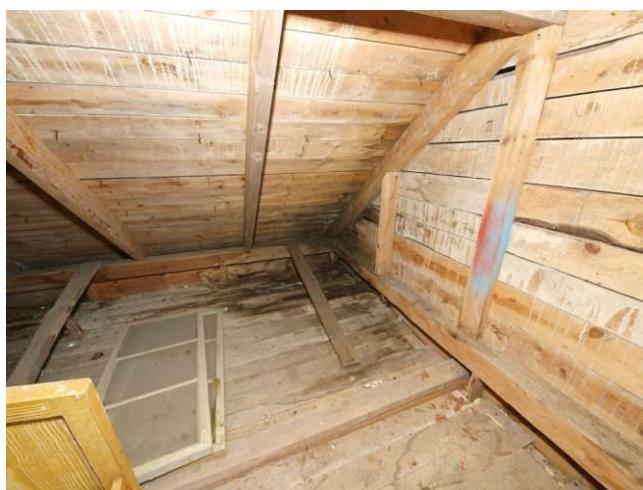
Waterdamage in the attic's northwest corner
